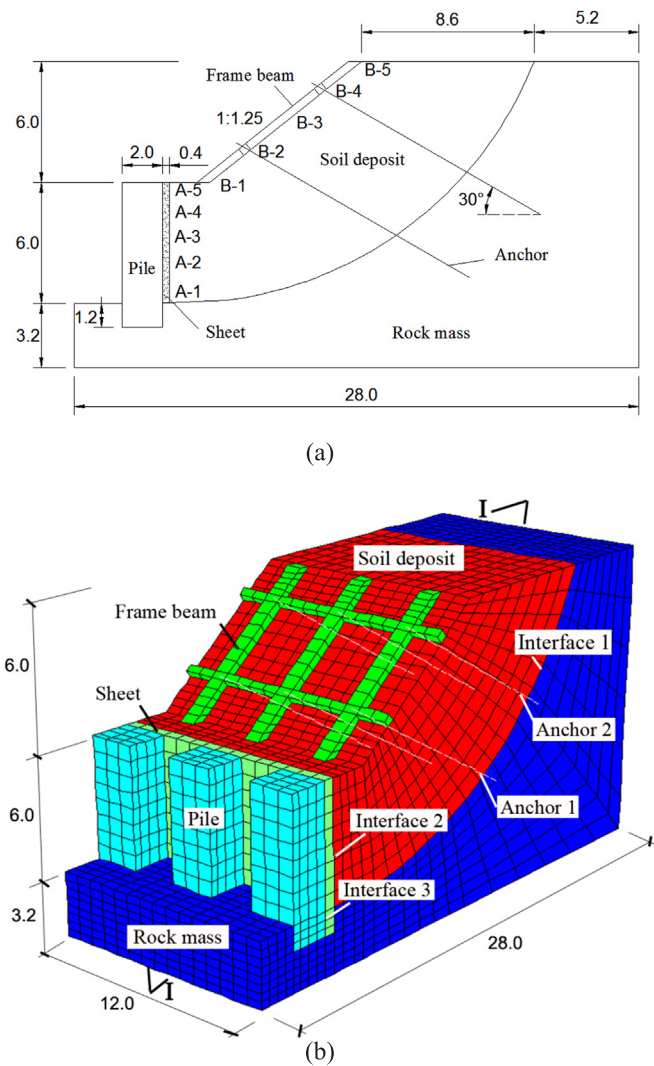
The prototype of a sheet-pile wall with anchoring frame beam (Unit: m). (a) A cross section of the prototype; (b) A panorama of full-scale numerical model.
